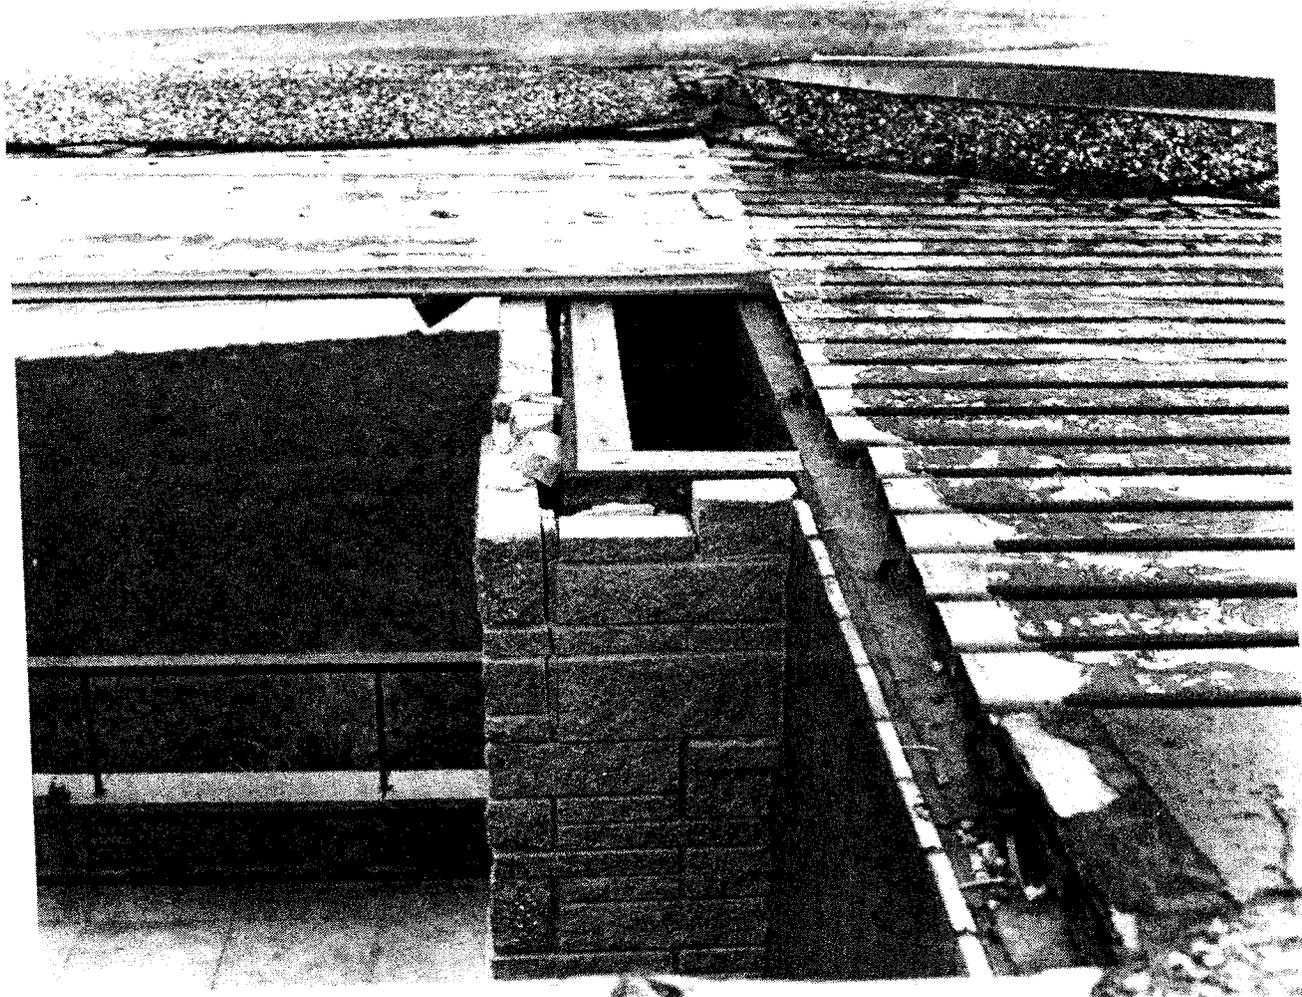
“Corner of roof near women’s restroom. Note damaged gutter corners and separated brick siding. Also note separation of wood plank facing from metal support beam.” photographer not known, not dated (taken immediately following windstorm of May 1, 1972), Image and copyright held by Badlands National Park, Interior, South Dakota.
